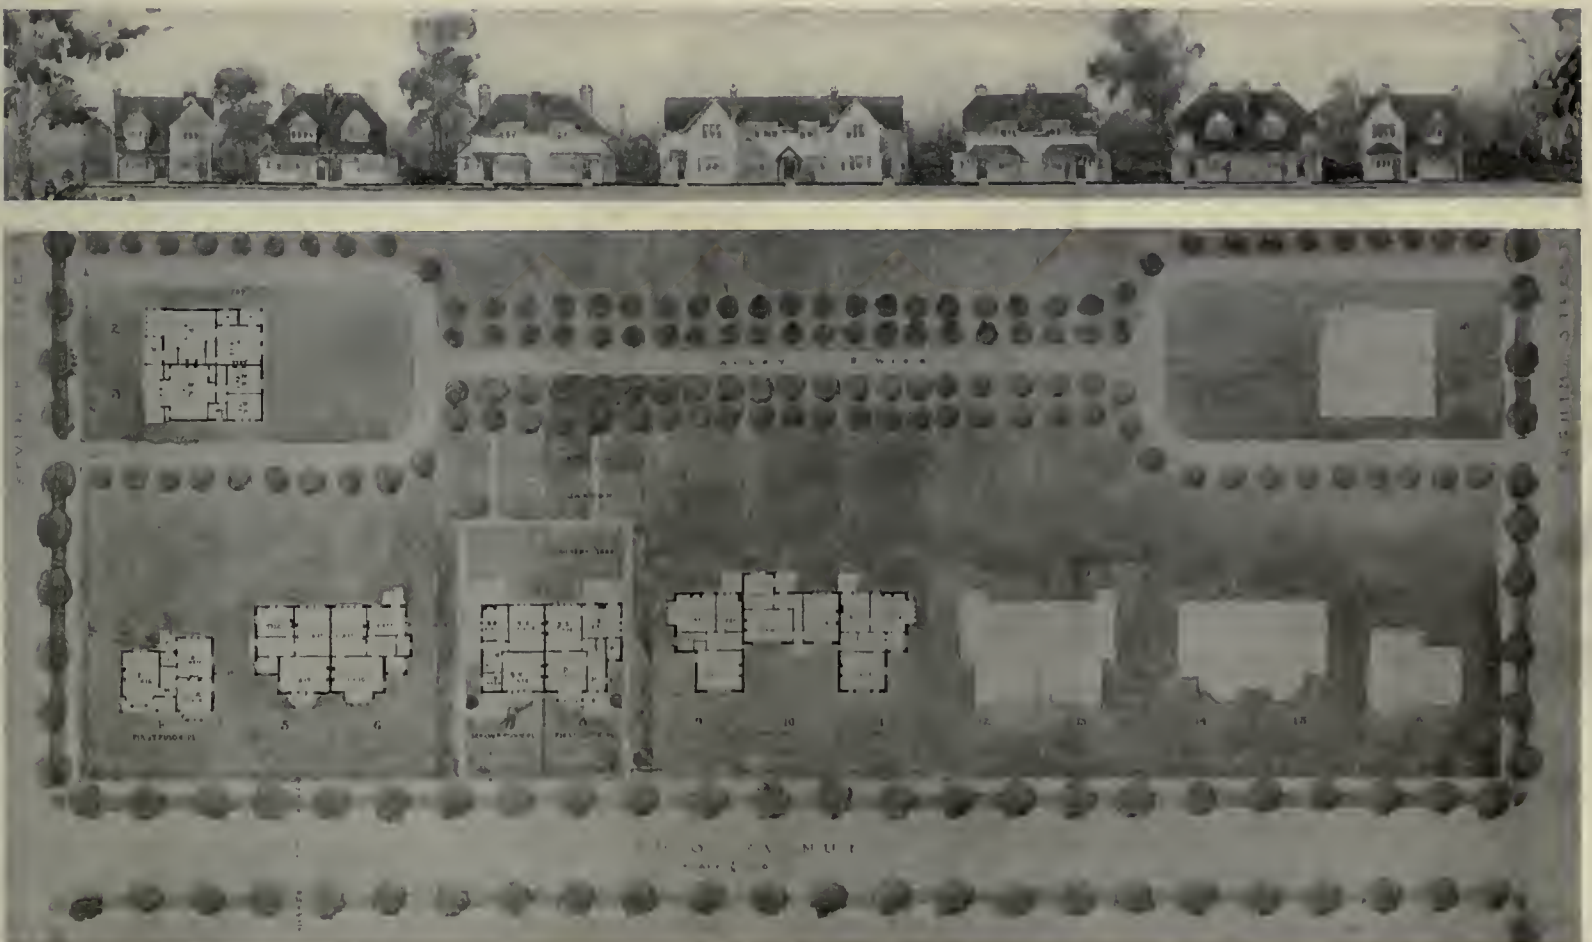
Preliminary Studies. Elevation and Part Plan of Typical Block on Ohio Avenue, between Seventh and Eighth Streets, Midland, Pa.
